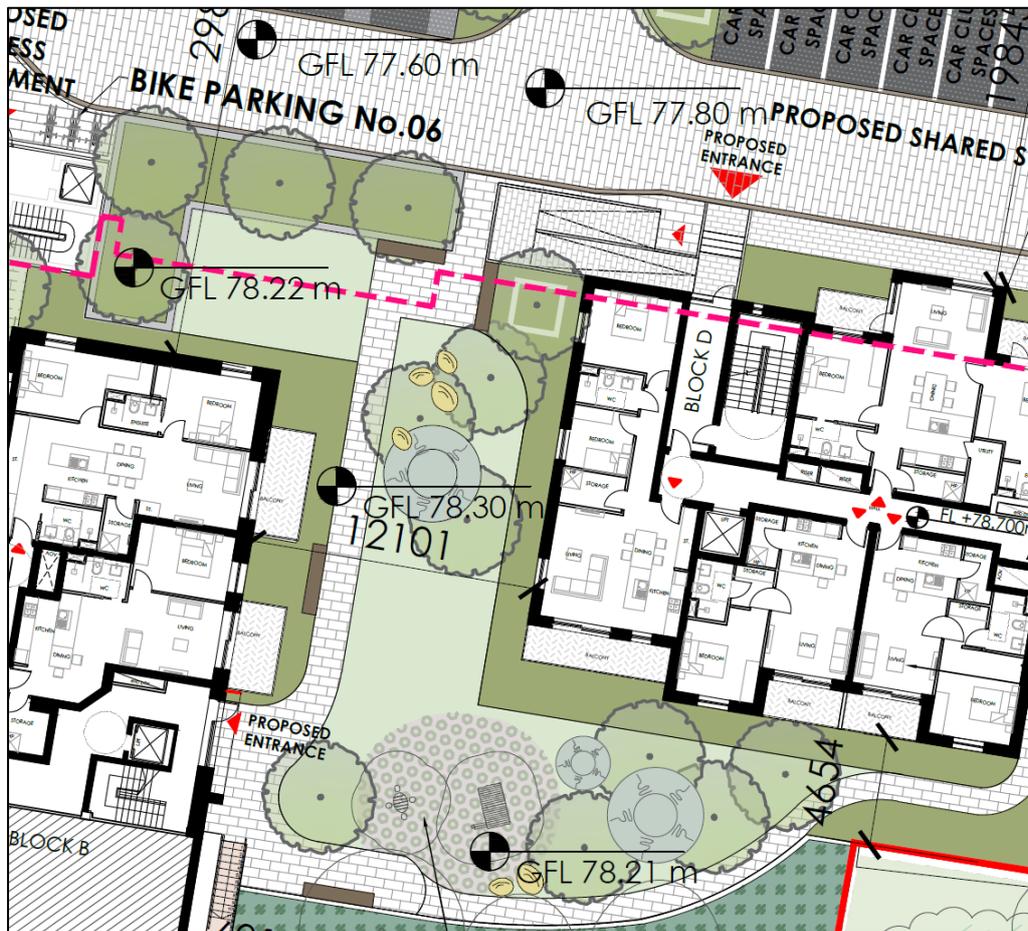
Extract from Site Layout Plan illustrating no directly opposing windows from Block B to Block D
